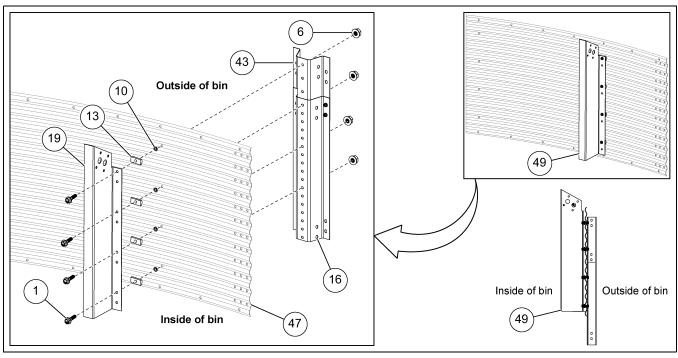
A Installing the Roof Rafter Bracket to the Top Outside Stiffener (Universal Stiffened Bins) - 2.66"
